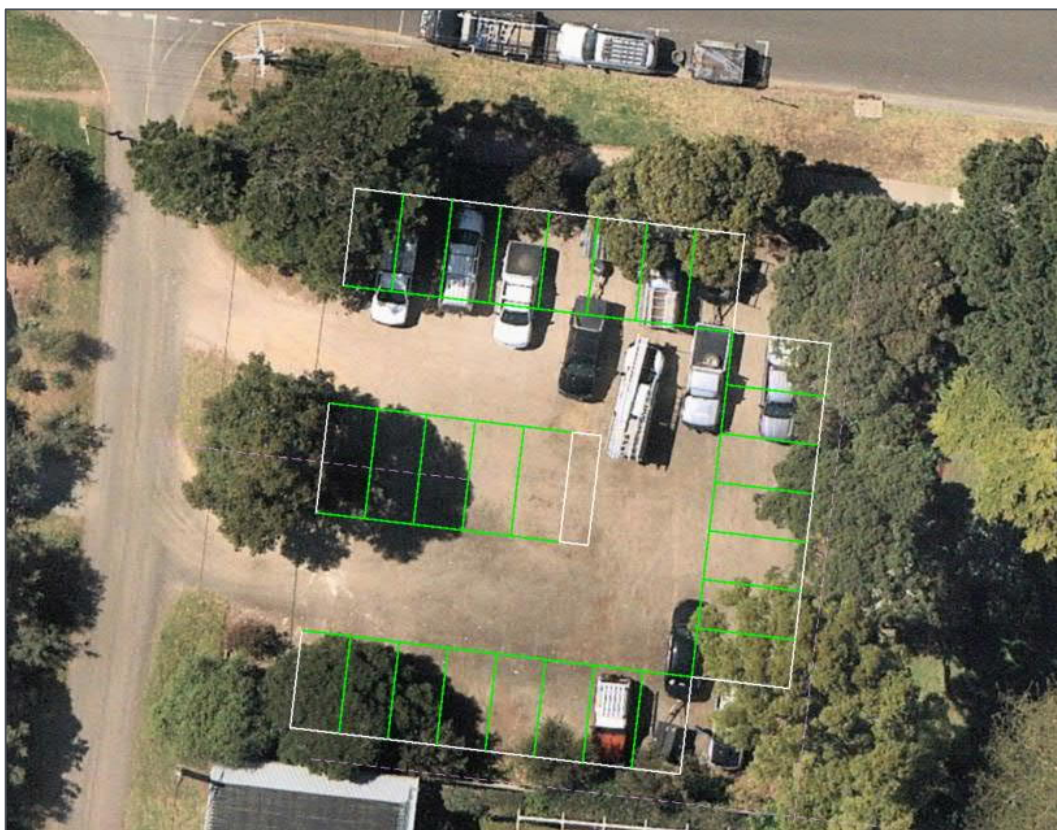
Seaview Avenue Potential Parking Area Layout (image source: NearMap)
